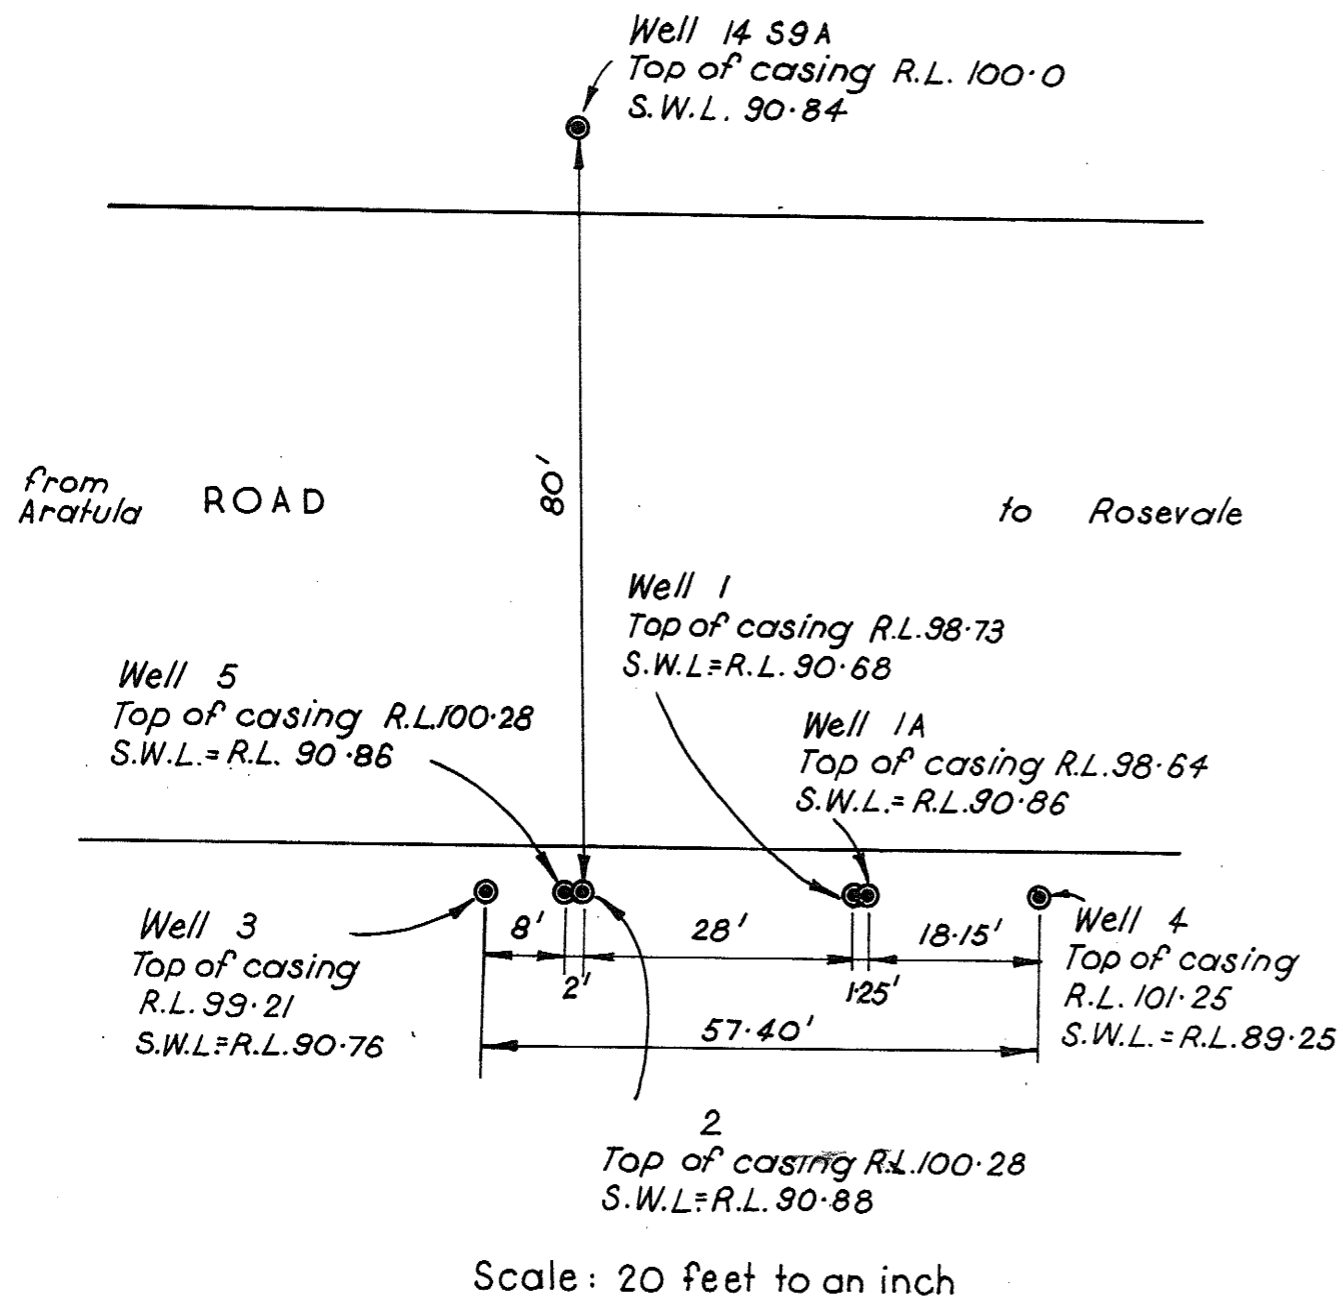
Plan of Field Testing Site at Rosevale.
